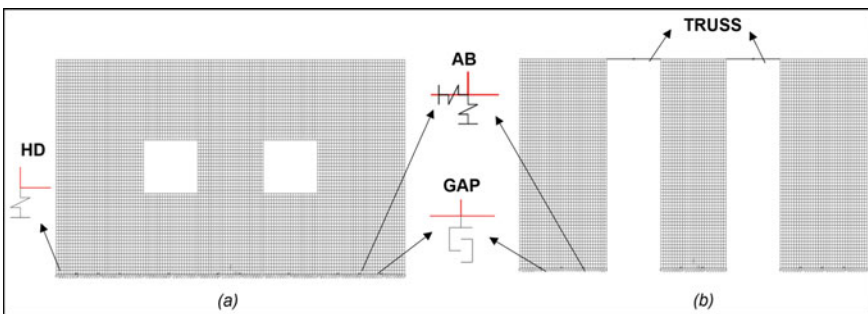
Numerical model for a single-storey CLT shearwall with two-window openings for MSW (a) and SSW shearwall (b)
